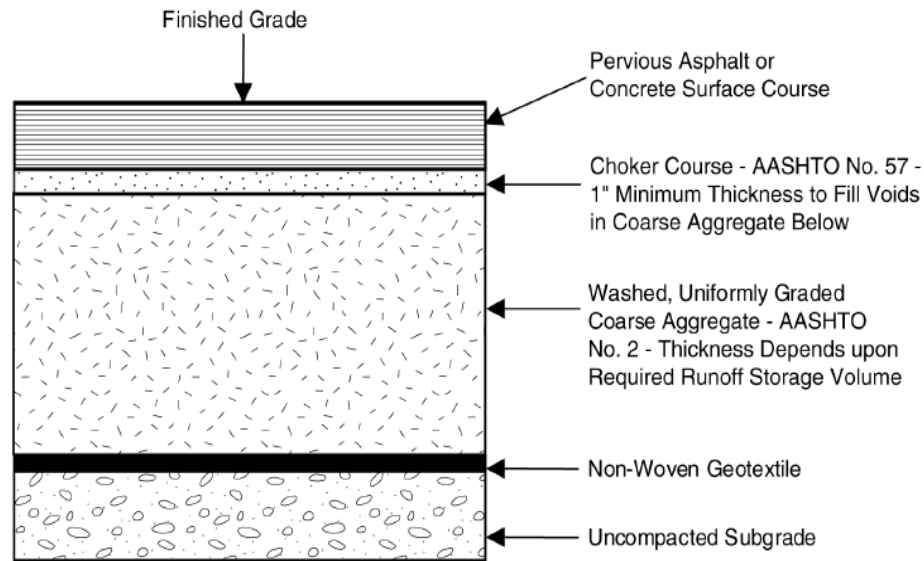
12 : Typical Cross Section of Permeable Bitumen Pavement
